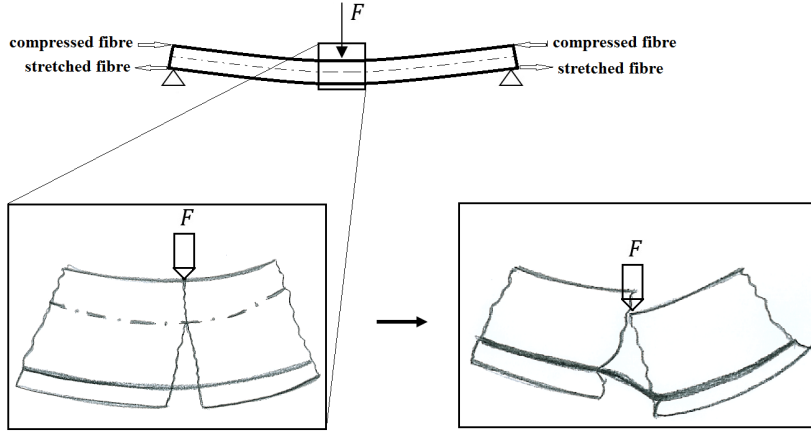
Concrete beam under heavy transversal load, compressed and stretched fibres, crack, rupture
